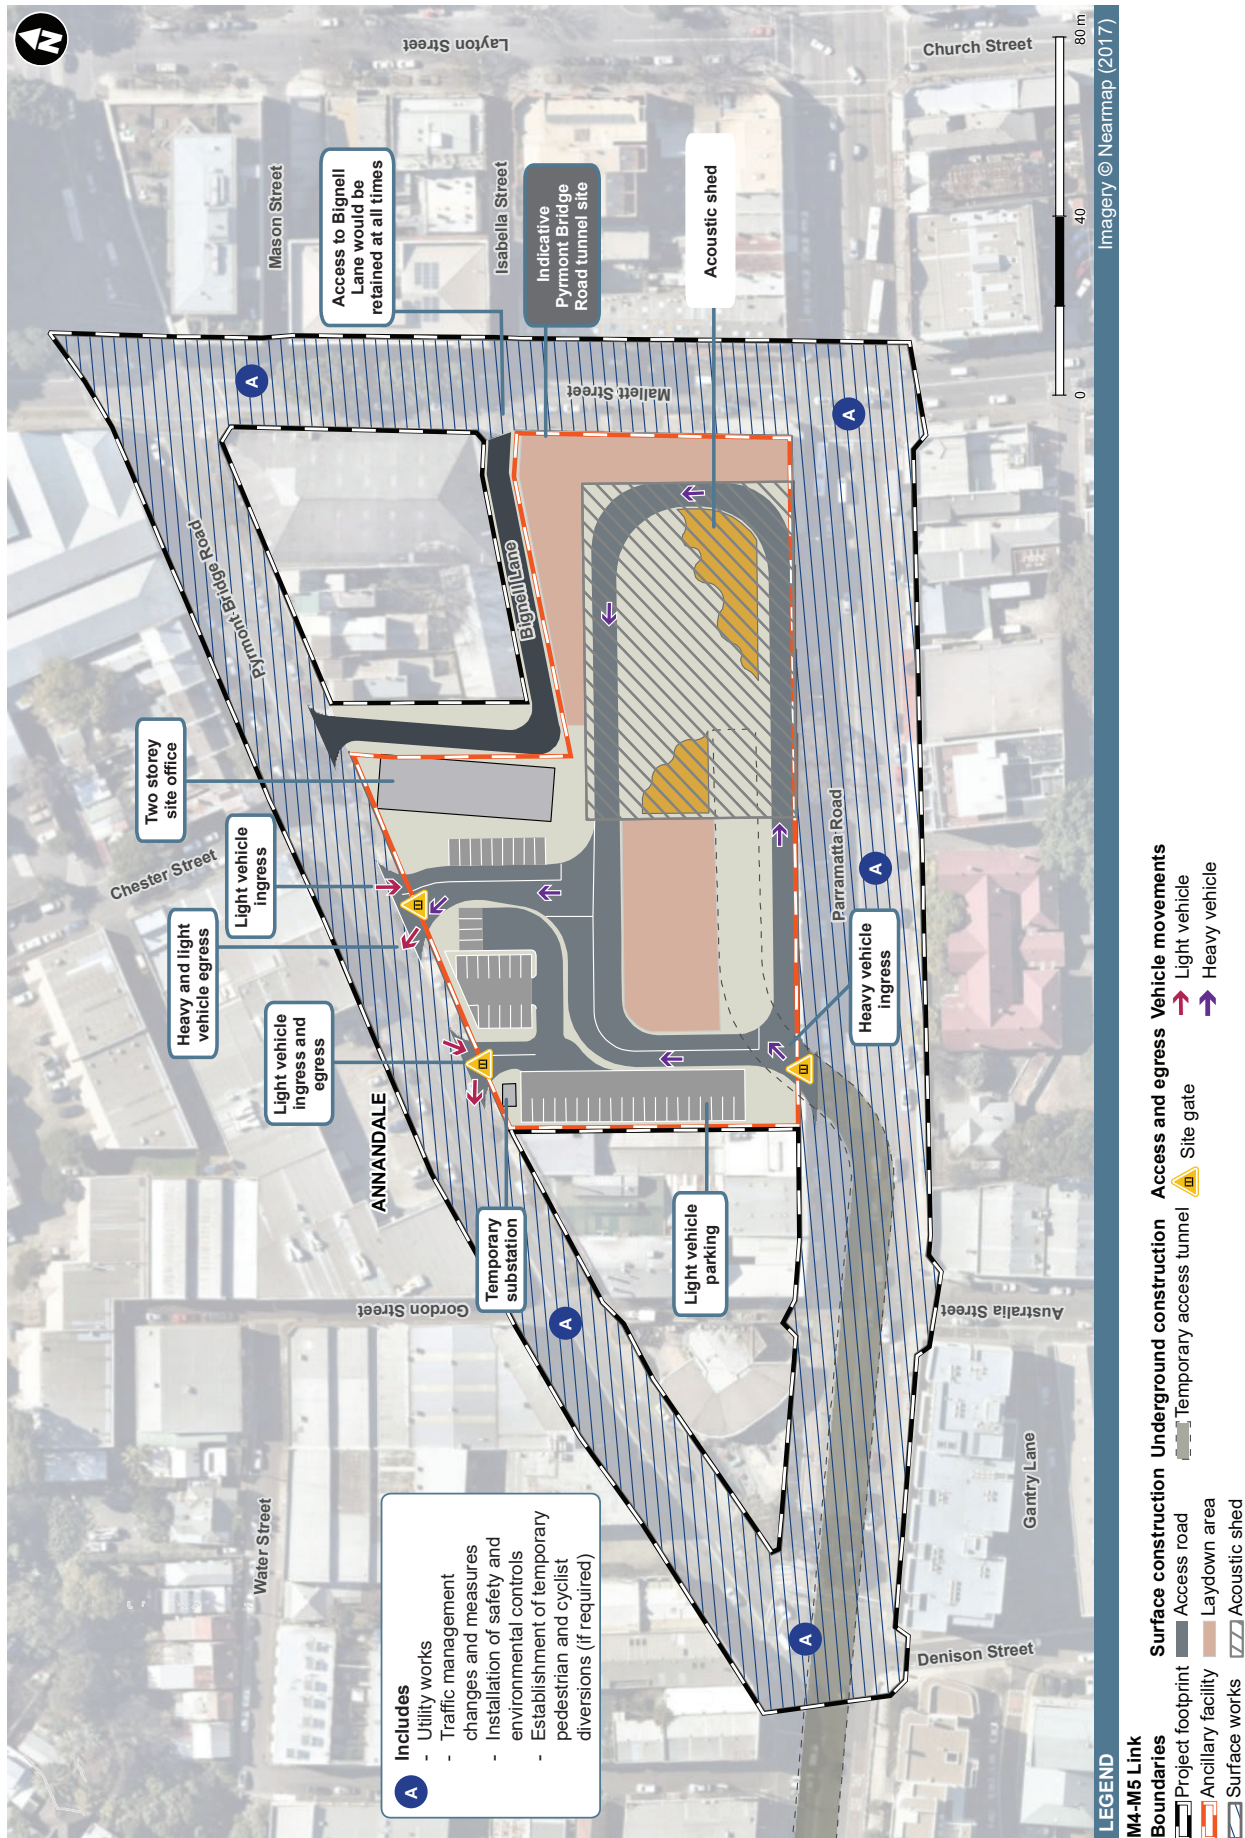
Indicative Pyrmont Bridge Road tunnel site layout
